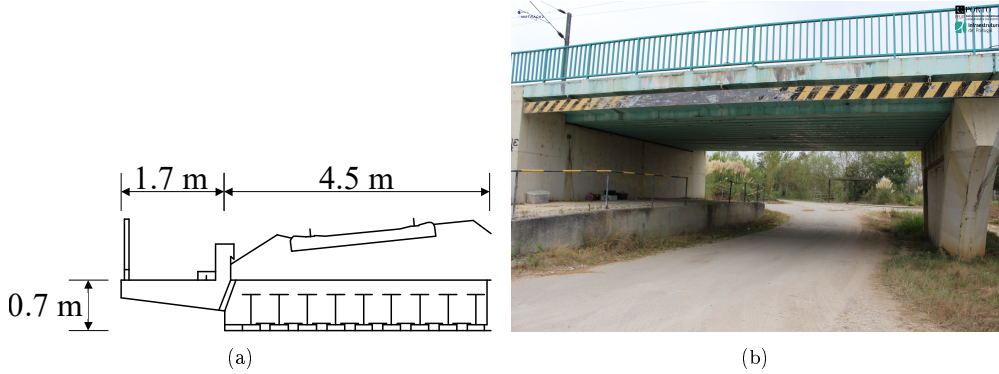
Canelas bridge. (a) Cross-section (unit: m) (adapted from Pimentel et al. [34]); (b) view of the first span.
